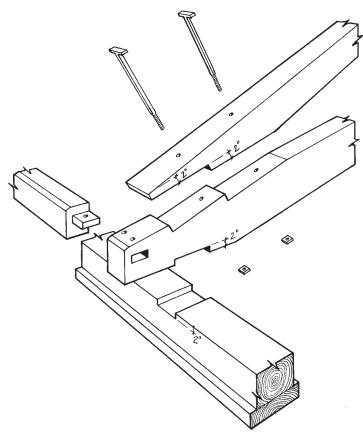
Exploded view of principal rafter bearing on scissor chord and scissor chord bearing on plate at St. Paul's.
